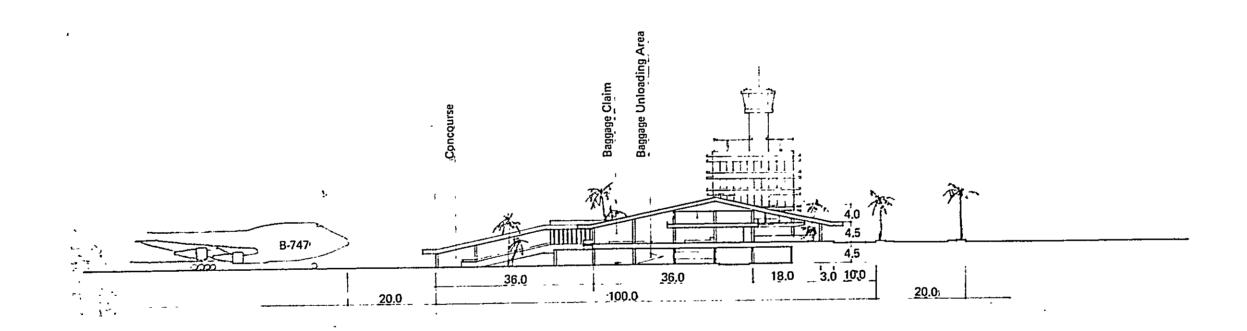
Proposed International Airport Terminal Building Section
